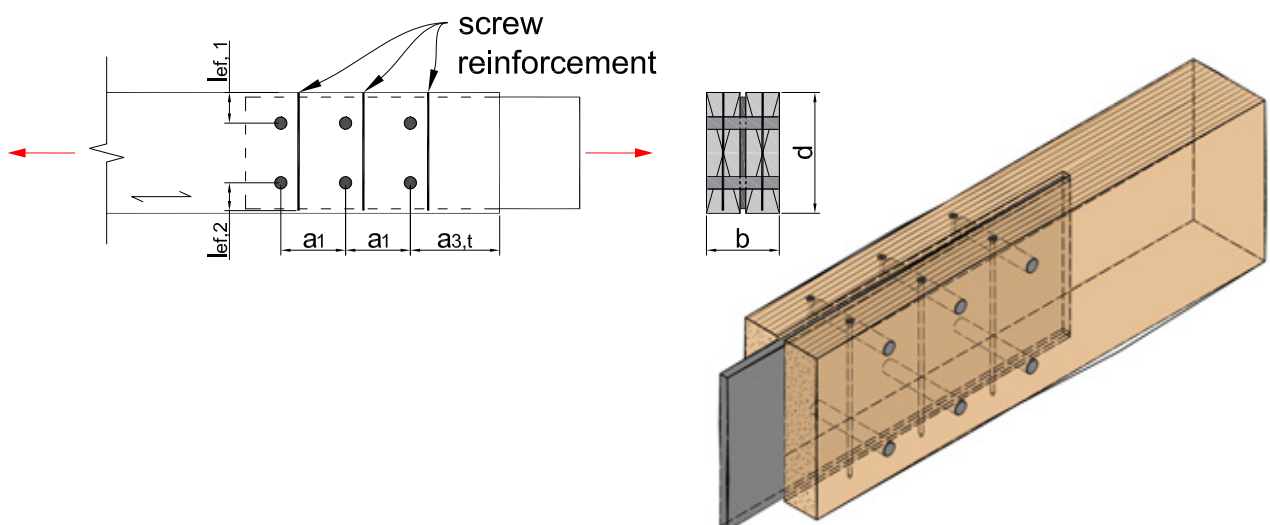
Reinforcement of a connection with multiple dowel type fasteners with multiple rows.
